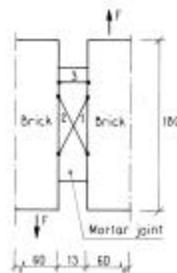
Measurement of the tangential (LVDT 1&2) and normal (LVDT 3) displacements. LVDT 4-6 on the opposite side not shown.
